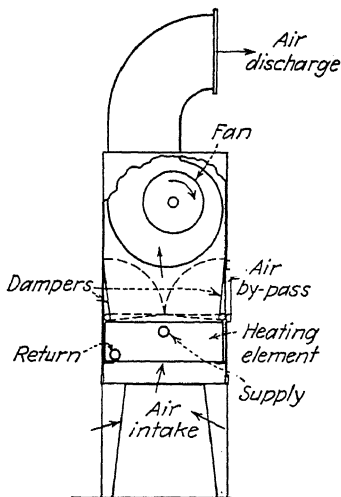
Floor-mounted unit heater, housed-type fan. (From "Heating, Ventilating, and Air Conditioning Guide," 1943.)
